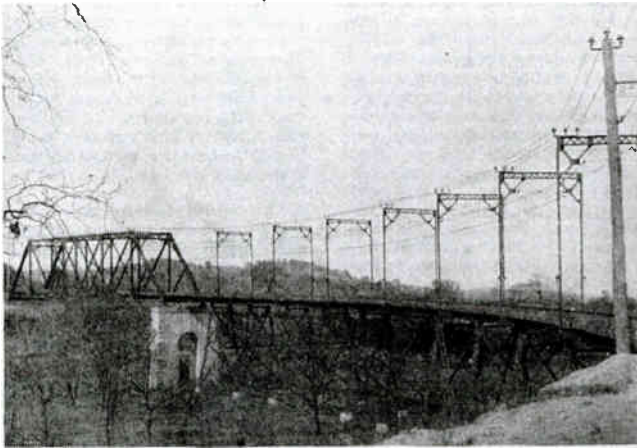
1200-Volt Overhead Line Construction on Steel Trestle, Pittsburg, Harmony, Butler and New Castle Railway, Pittsburg, Pa.
